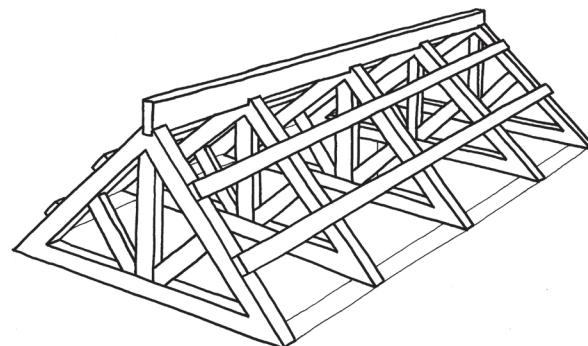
This roof frame is a frame structure made from wooden planks, a natural material. The planks support the roof.
